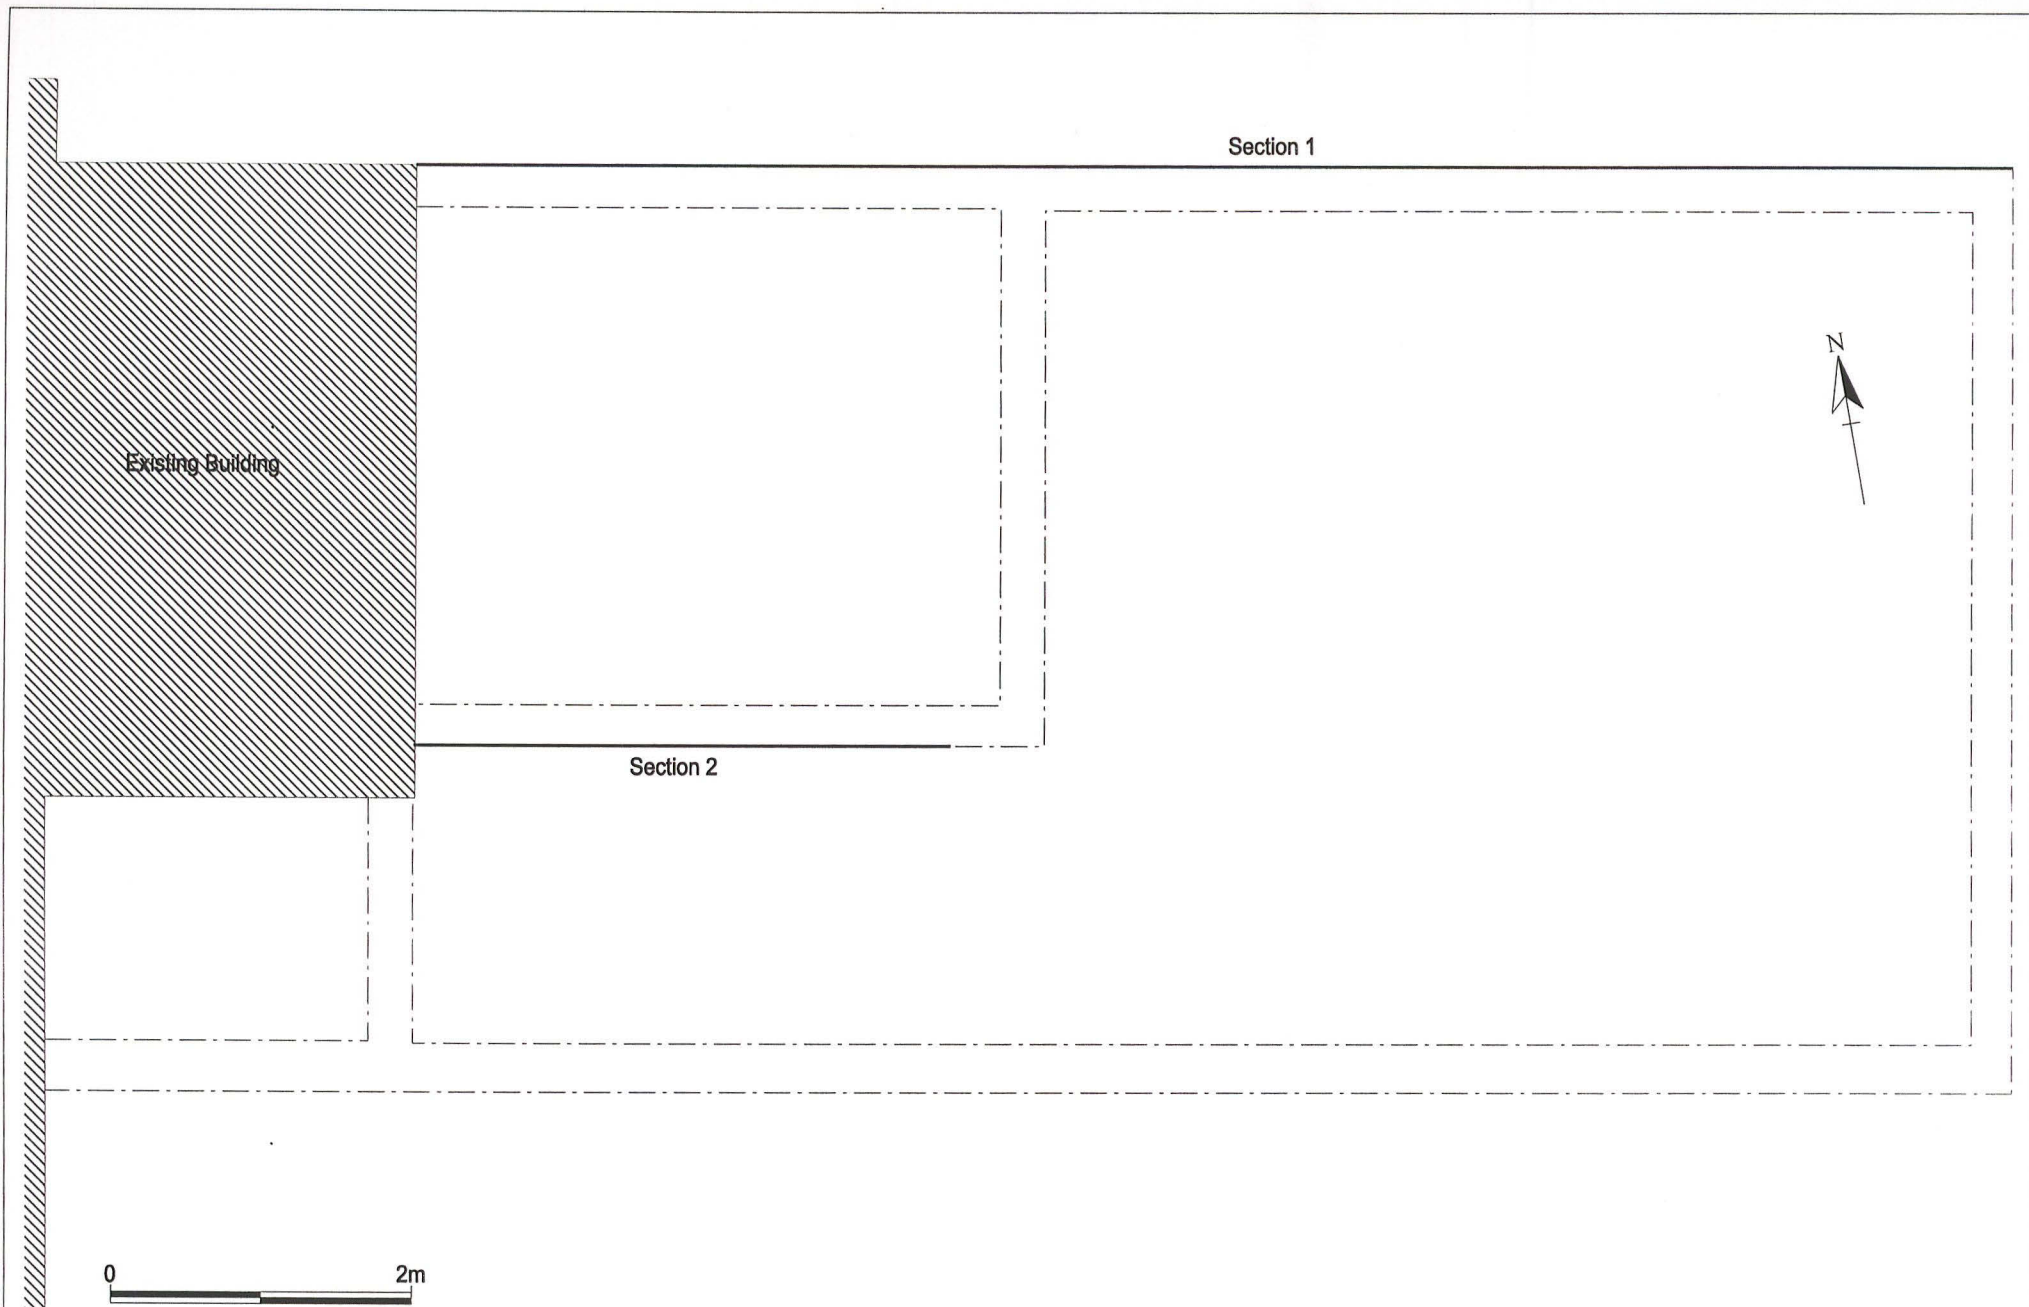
Plan of Footing Showing Section Locations. Scale 1:50.
